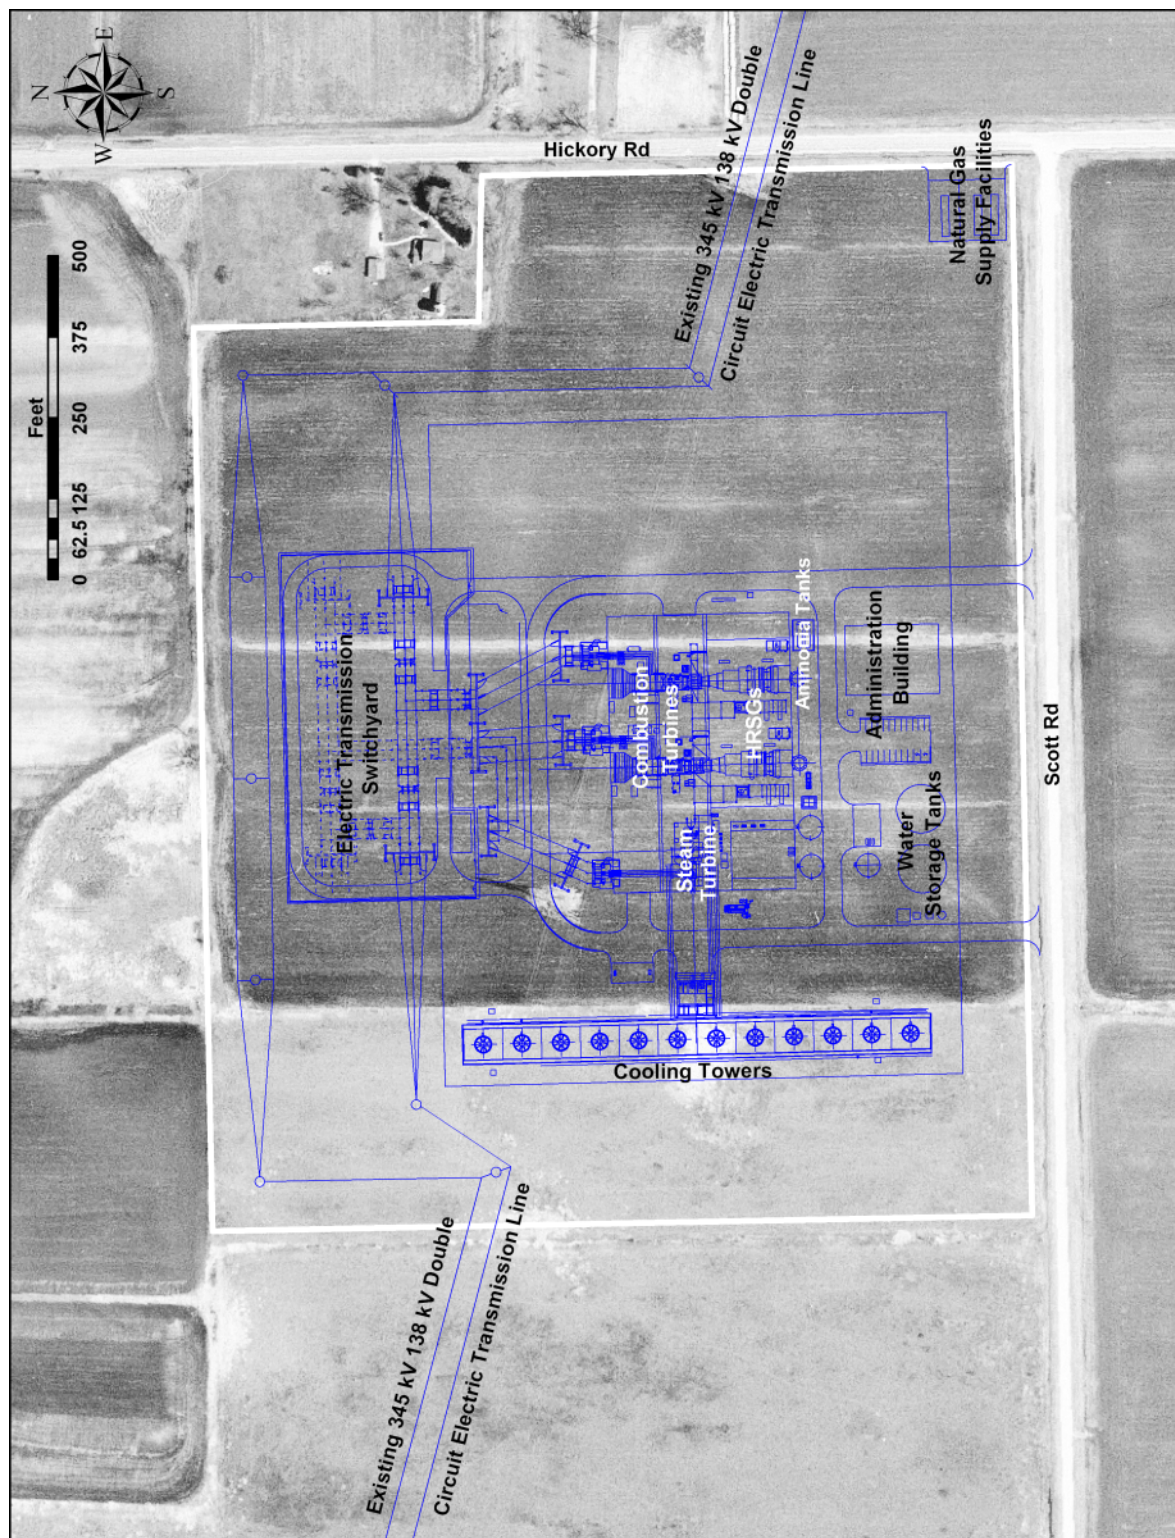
Preliminary layout for the proposed power plant at the River Road Site
